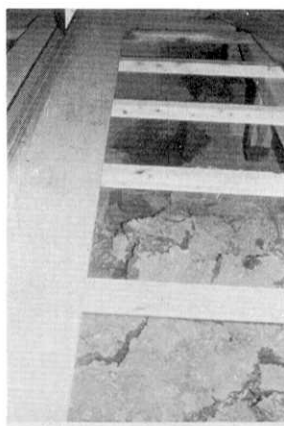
Fault crack which destroyed a house foundation.
